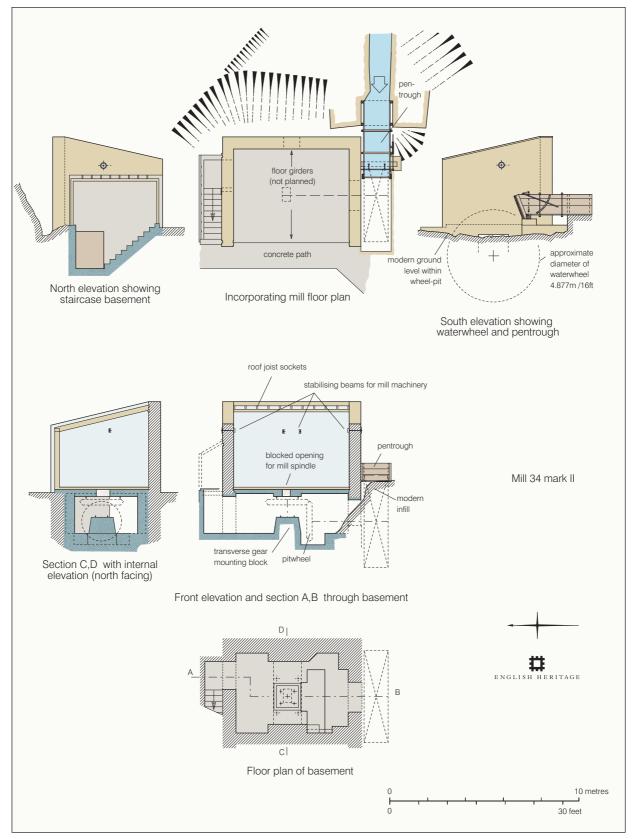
EH plans and sections of incorporating mill 34 mark II(see page xiv for key to conventions)
